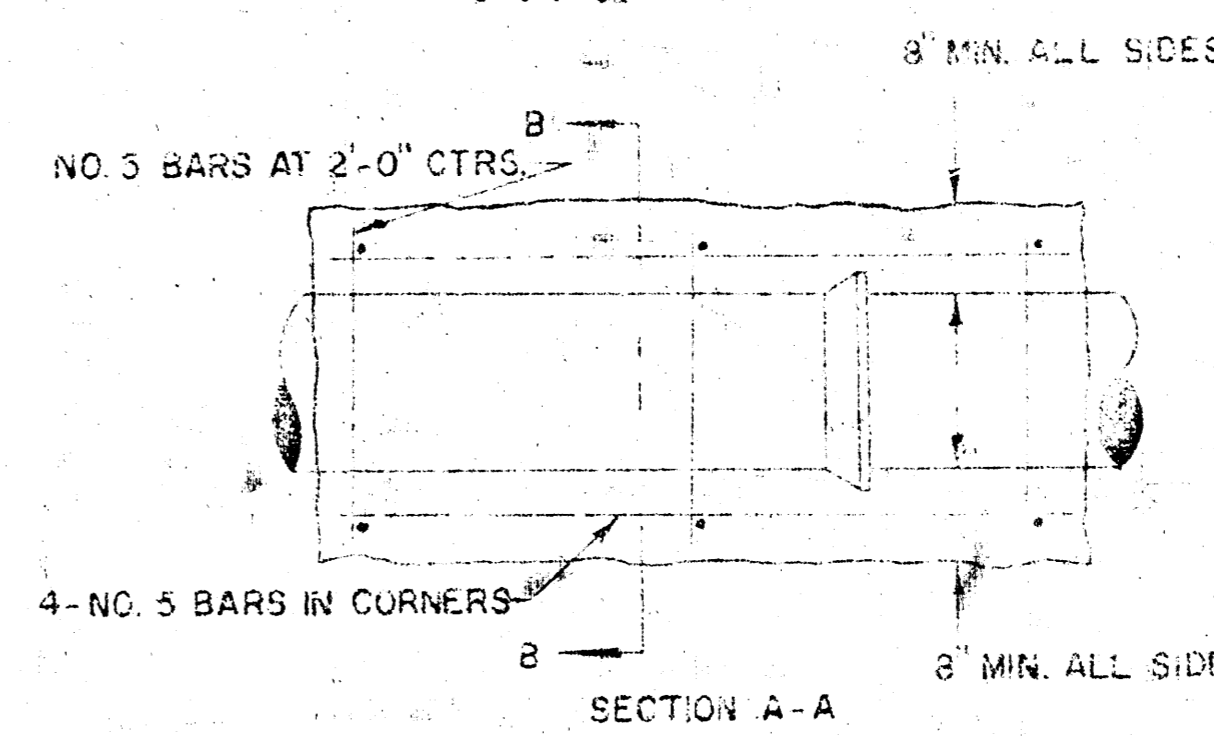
DETAIL OF DROP STACK FOR EXISTING MANHOLES IN GROUND WATER
